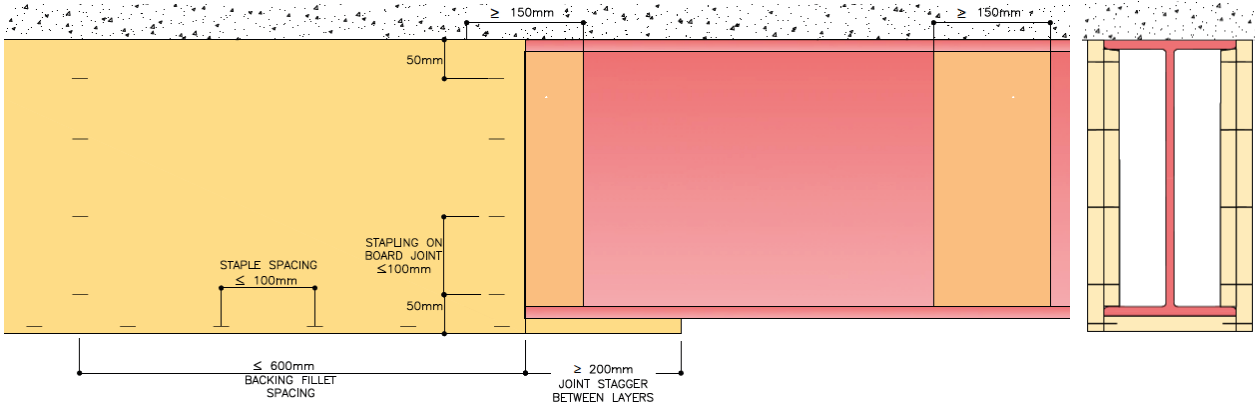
Elevation and cross-section view of Universal Steel Beam, showing fixing of Knauf Fireboard to underside of Universal Steel Beam
